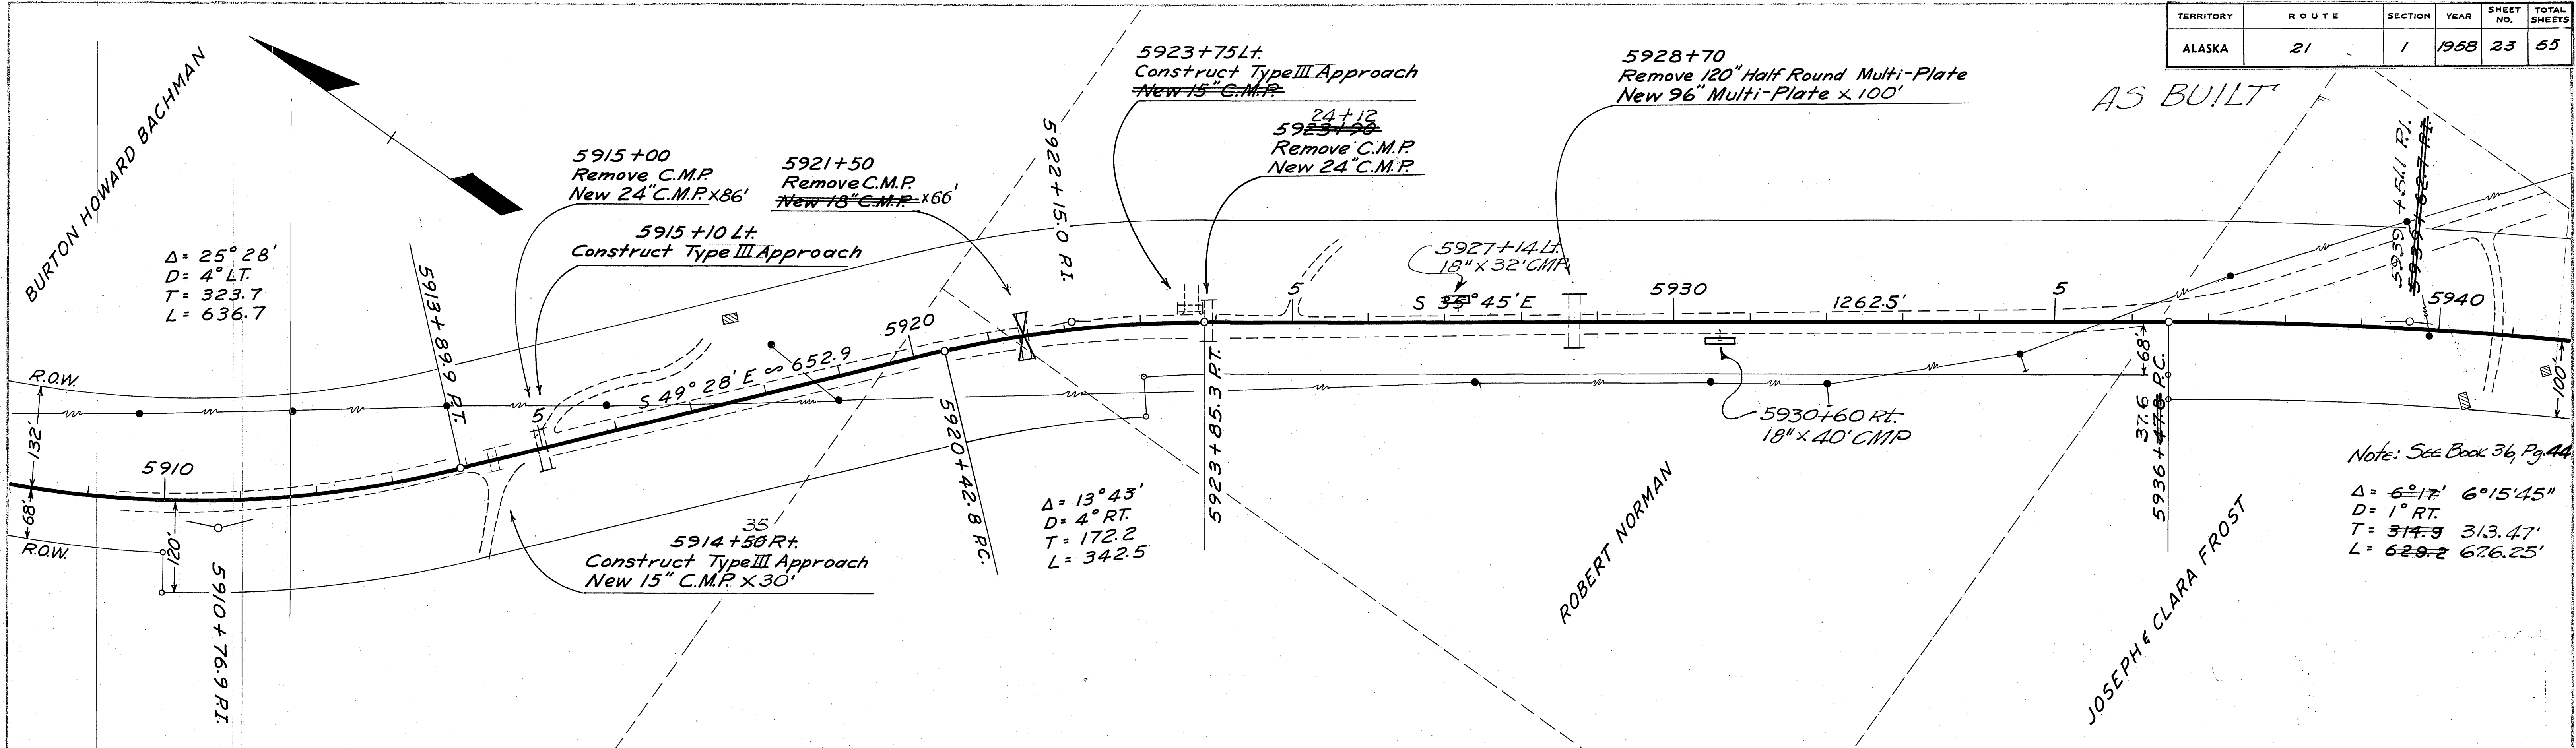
PLAN - PROFILE - O.P.R. & R.E. STANDARD
